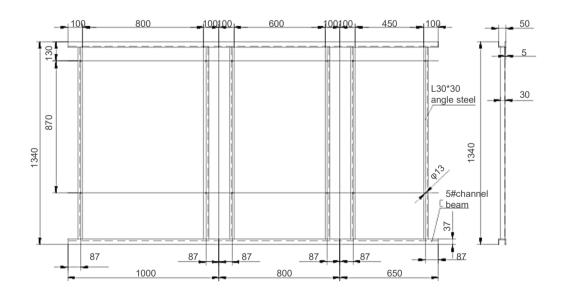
Typical basic frame foundation (for 1000mm/800mm/650mm width dimension model)
